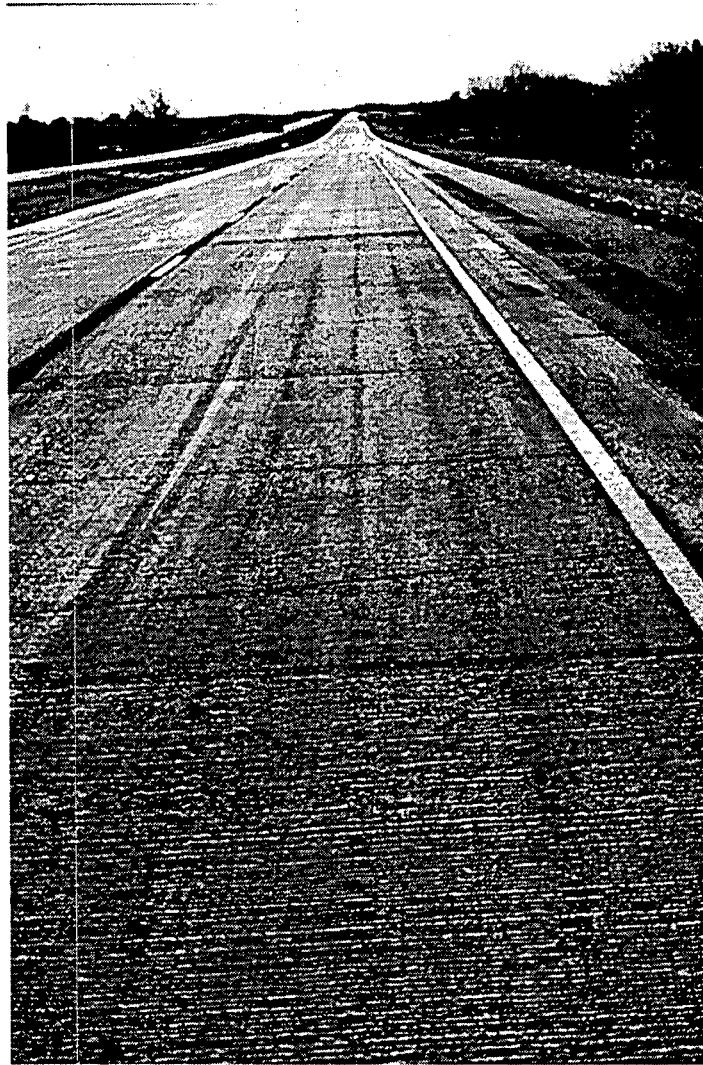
Vibrator trails in pavement surface on US 65 in Polk County.
